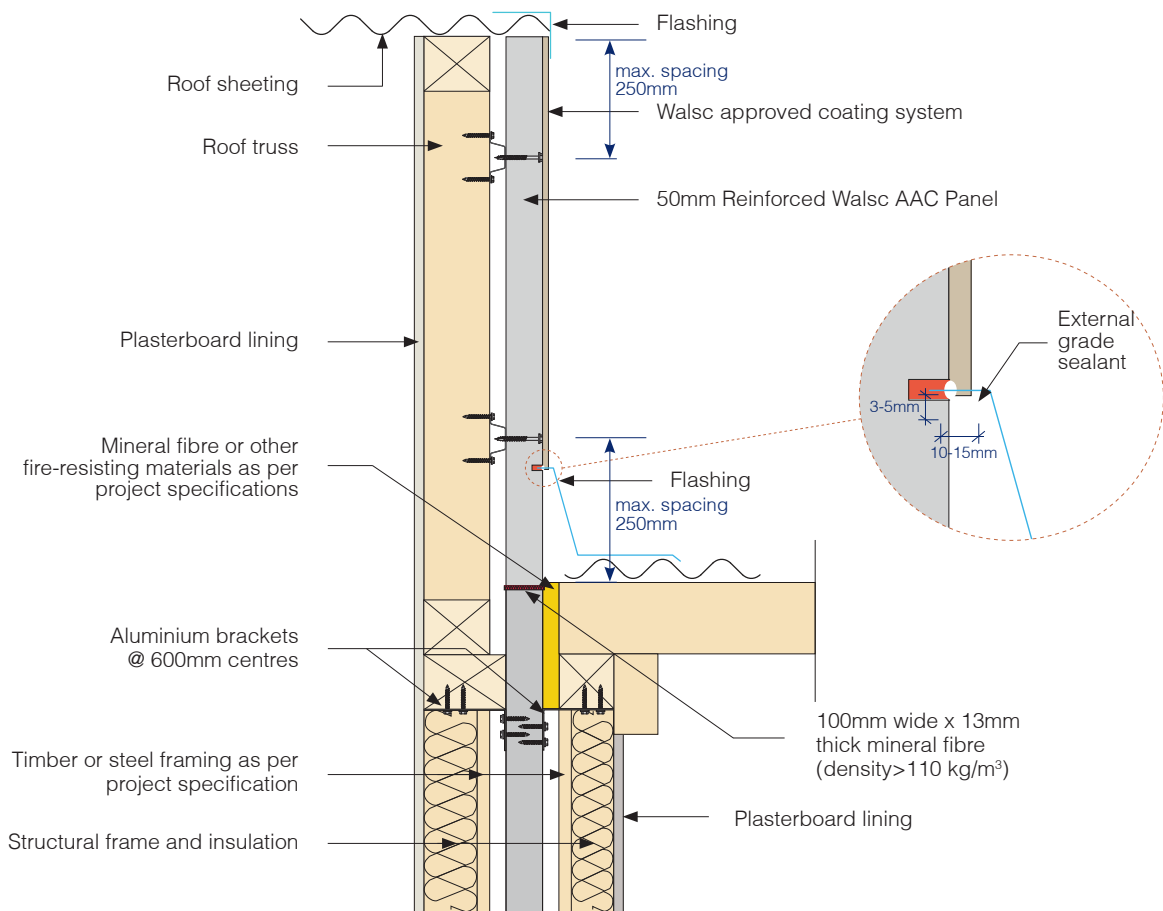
Vertically Aligned System Inter-tenancy Wall to External Walls Detail A
